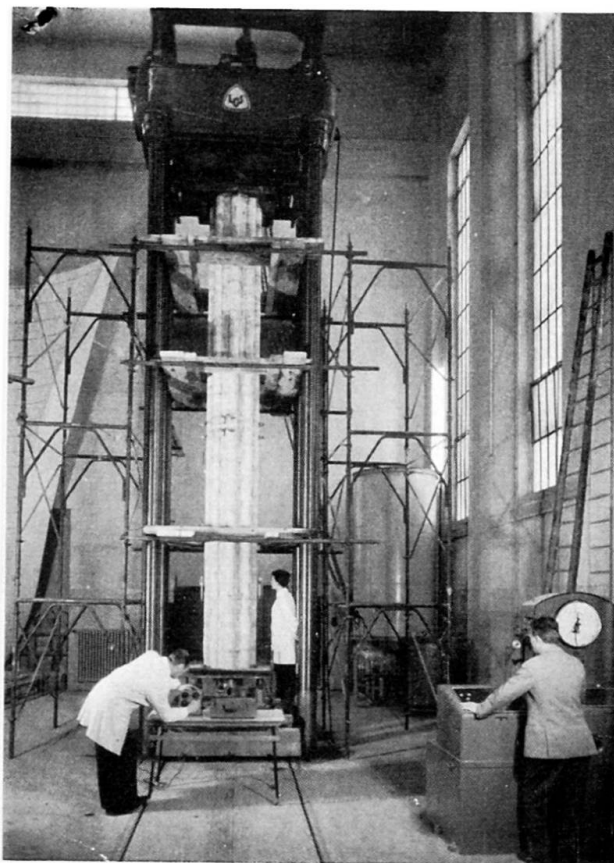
Milan Cathedral. Model of column under test. Scale 1:4.
